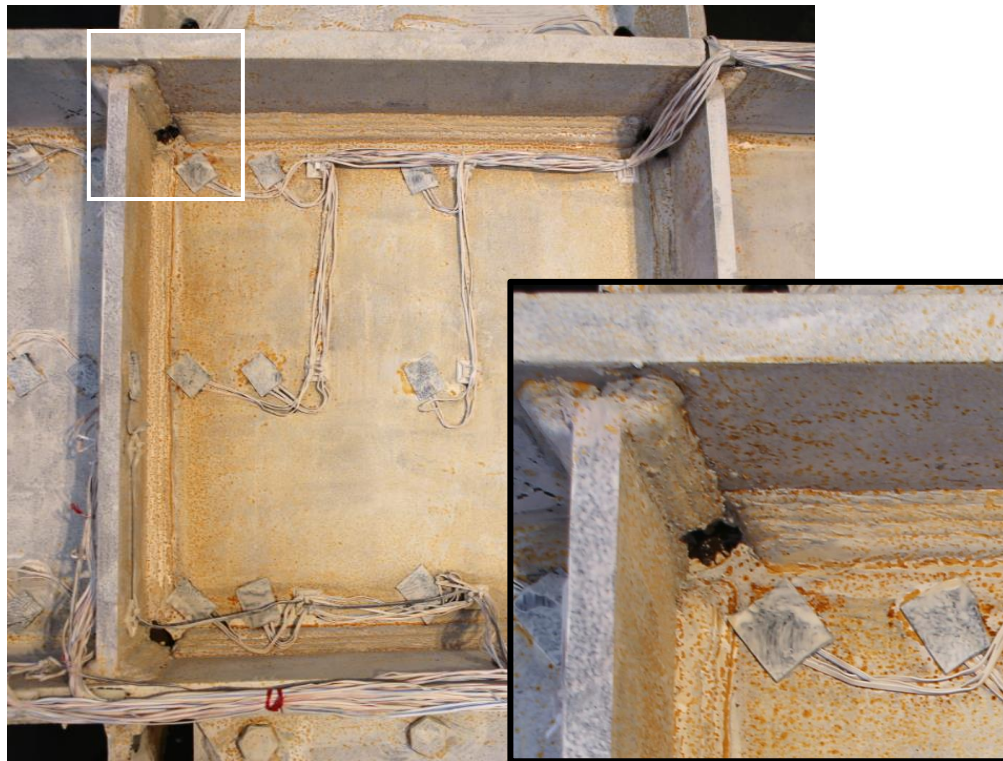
Specimen W4: Panel Zone (End of Test)
